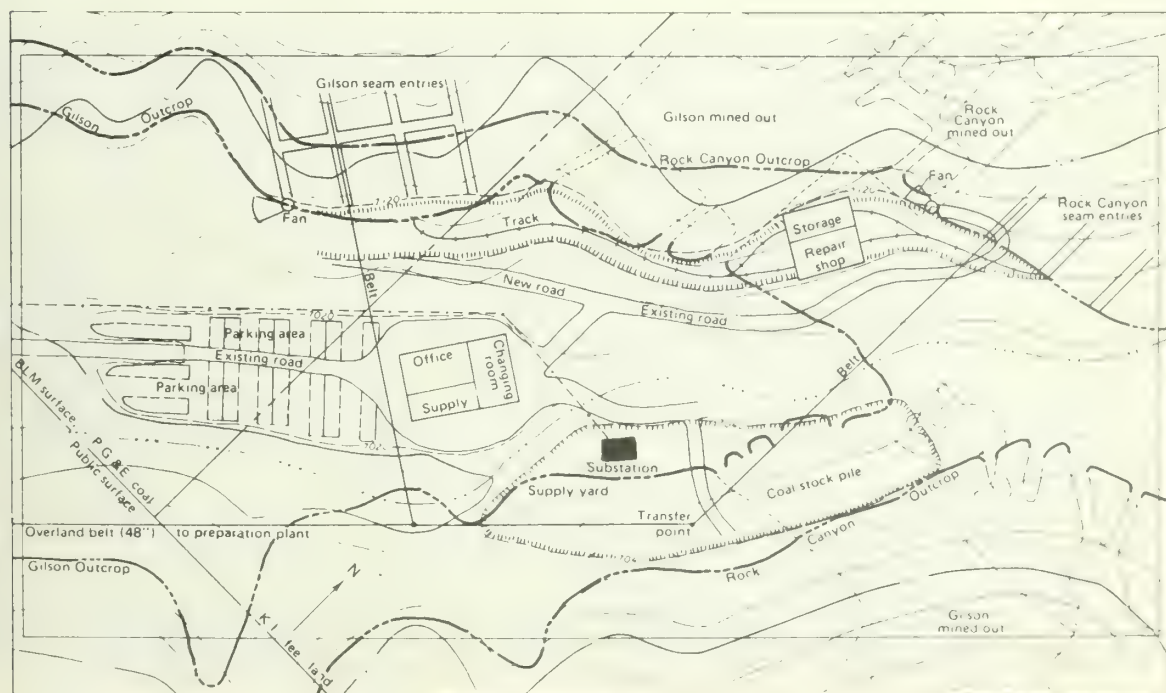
Surface facility layout of a typical Utah underground coal mine. (David Morris, John T. Boyd Co)
